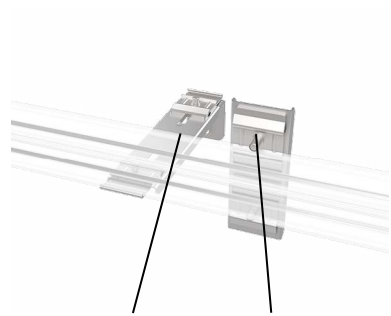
Partially high construction in front of the wall and one side load-bearing wall
